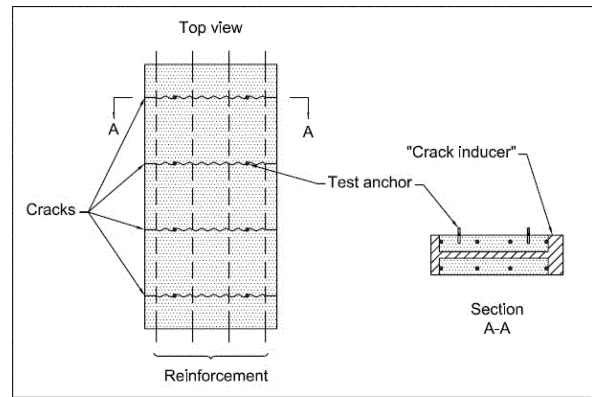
Example of test member for anchors in tension in cracked concrete.
